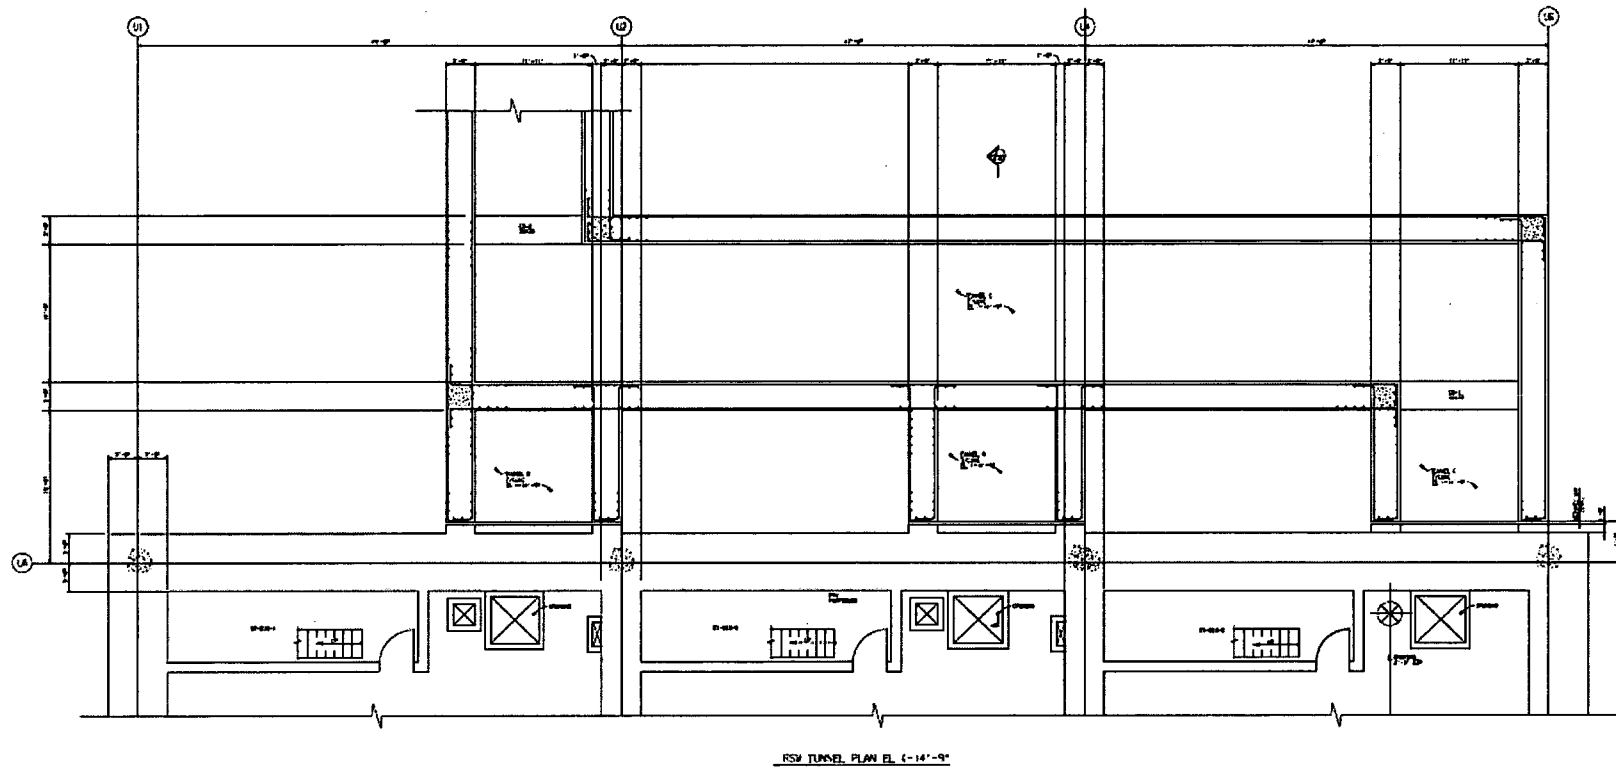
S1.269: Partial Plan of RSW Piping Tunnel and RSW Pump House
